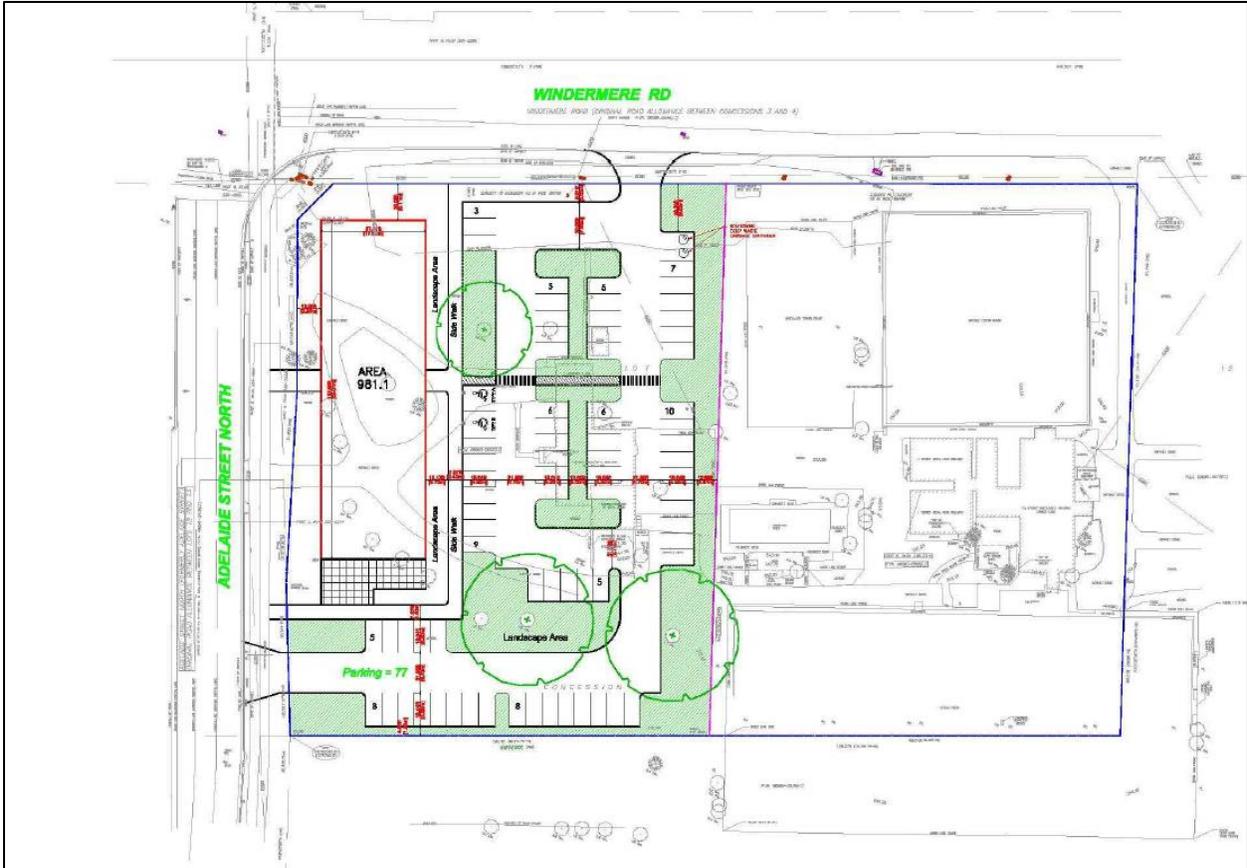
Site Concept for 1310 Adelaide Street (2016)
